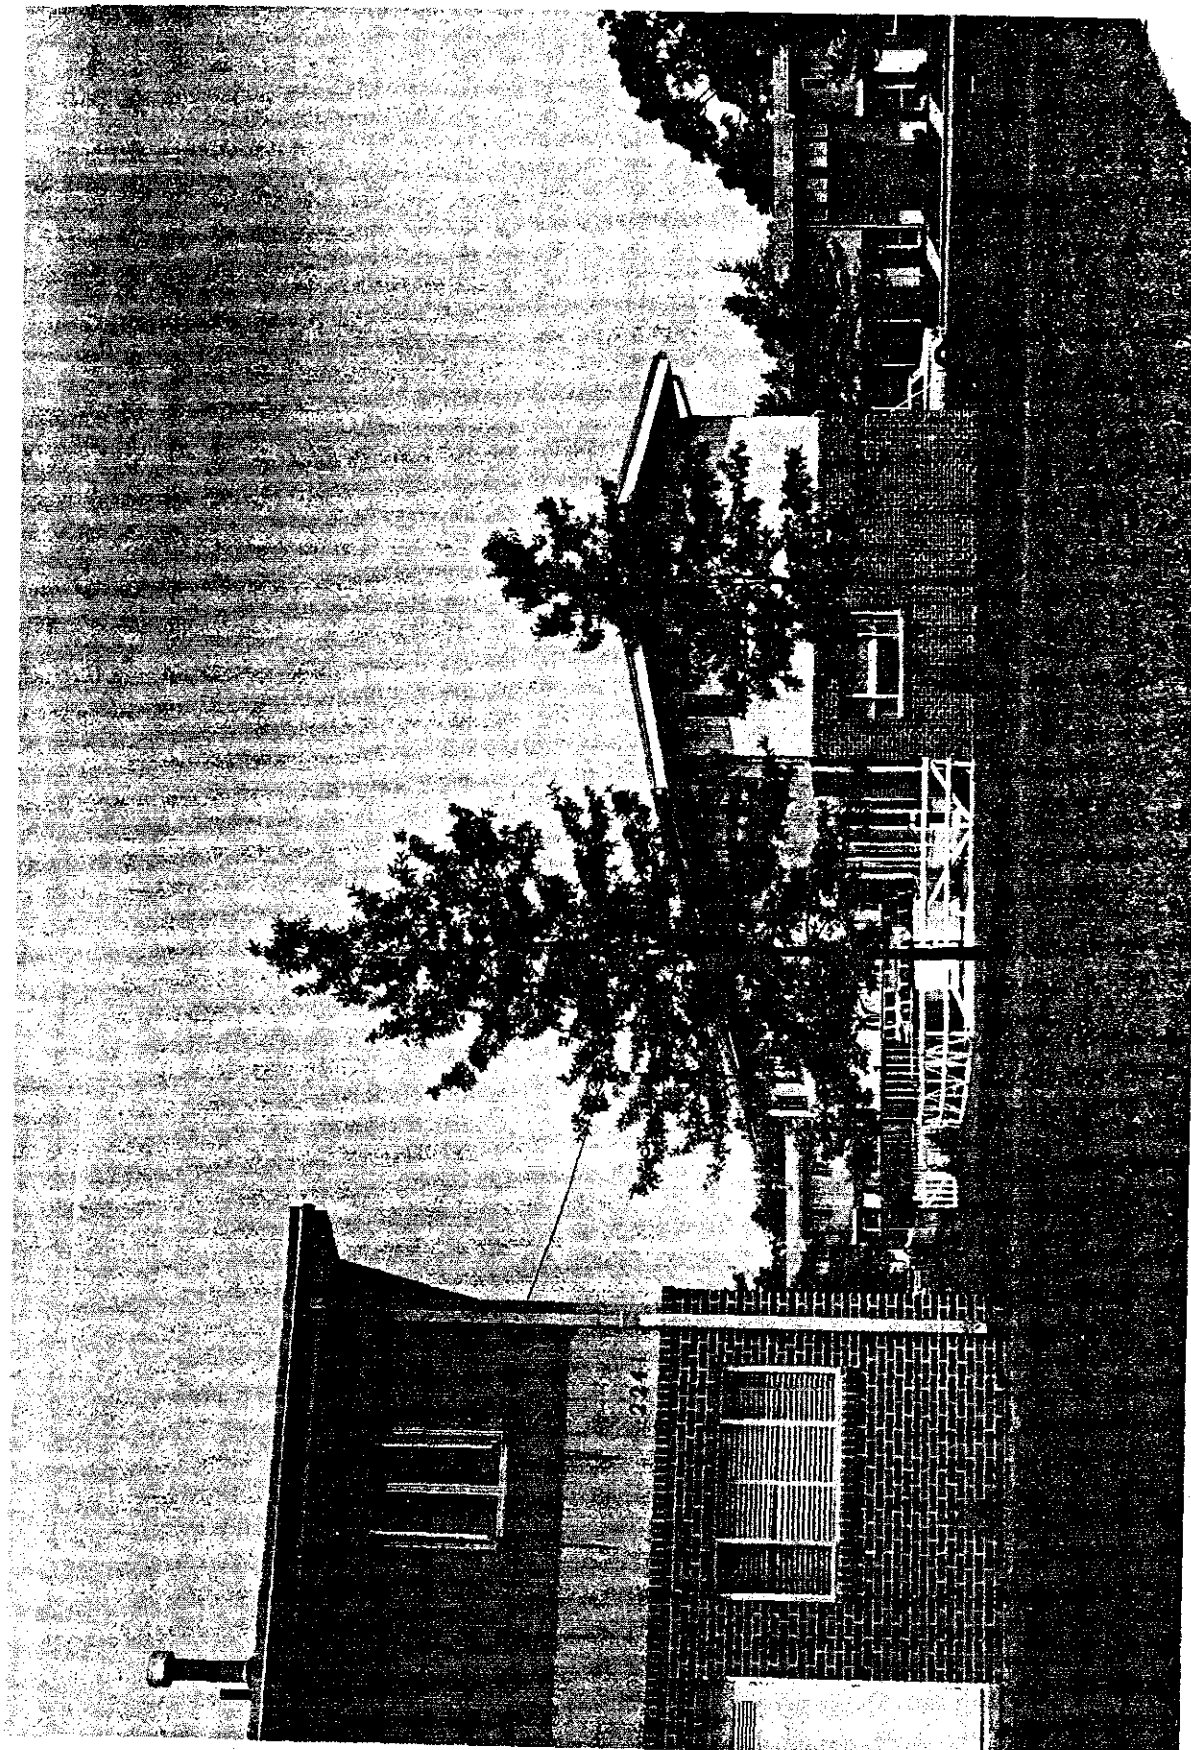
Photograph taken c. 1965 showing Capehart Housing Units constructed at the Charles Wood area between 1958 and 1960. View showing typical building layout. (Source: Fort Monmouth Installation Brochure, 1974)
